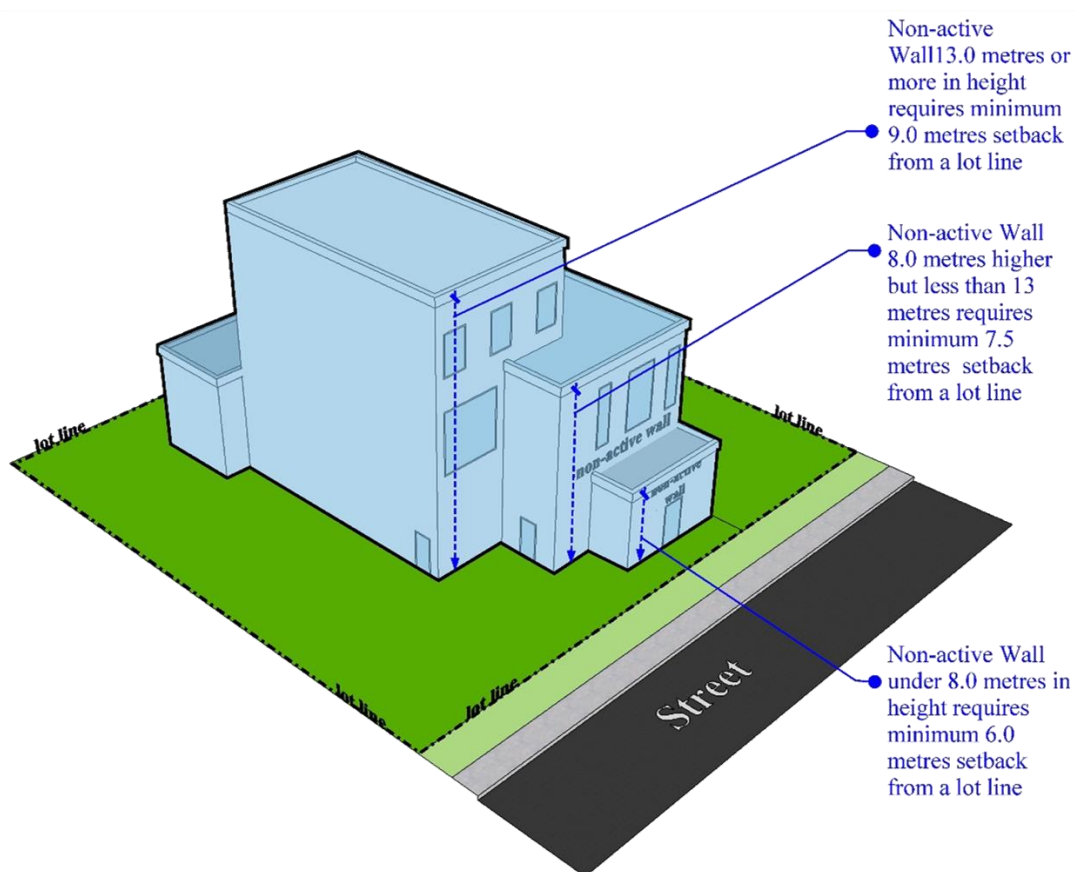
C.F3: Mixed Large Market Zone Non-Active Wall
